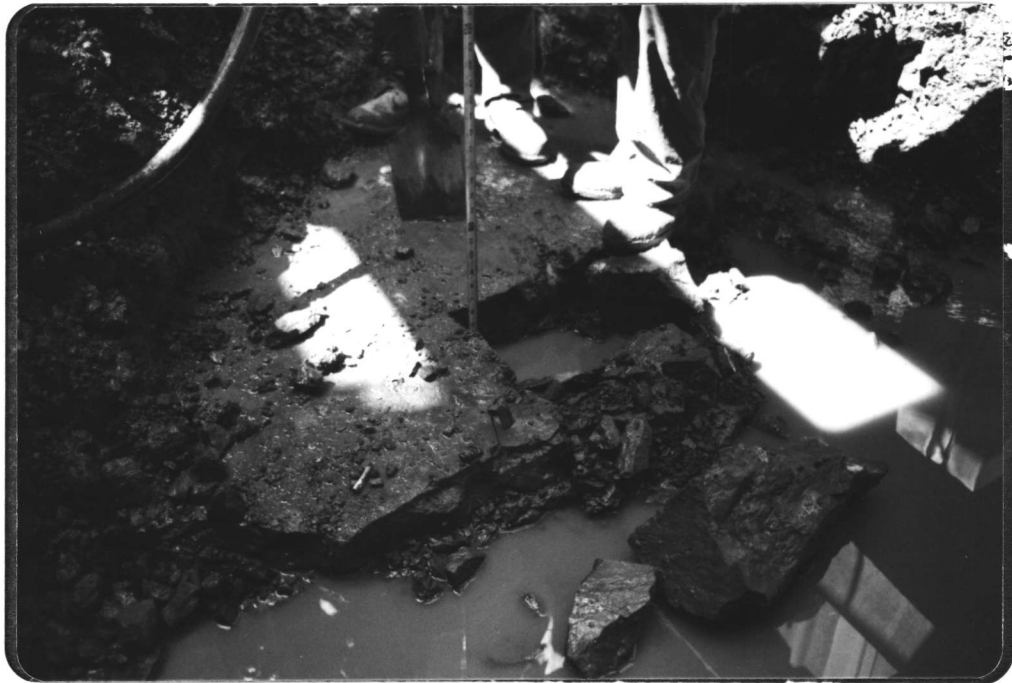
Rock being broken up with mechanical spade at northeast quadrant of cell at approximately elevation 248 feet.
